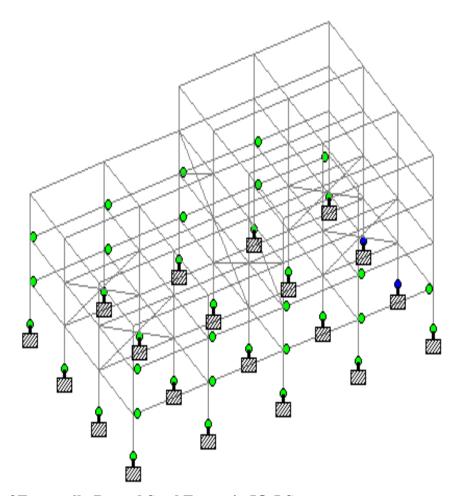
24Members of Externally Braced Steel Frame in IO-LS
